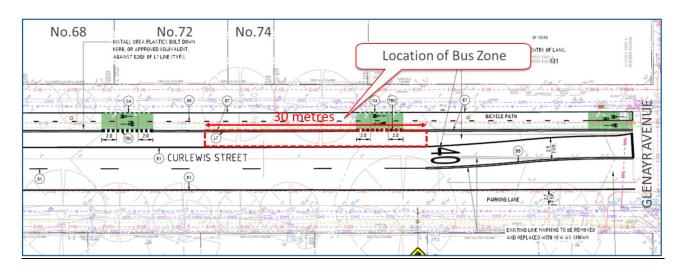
Curlewis Street cycleway, north of Glenayr Avenue.
